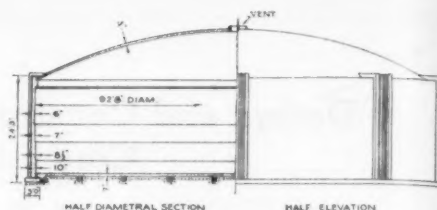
Half Section, Half Elevation of 1-mil.gal. Reservoir
